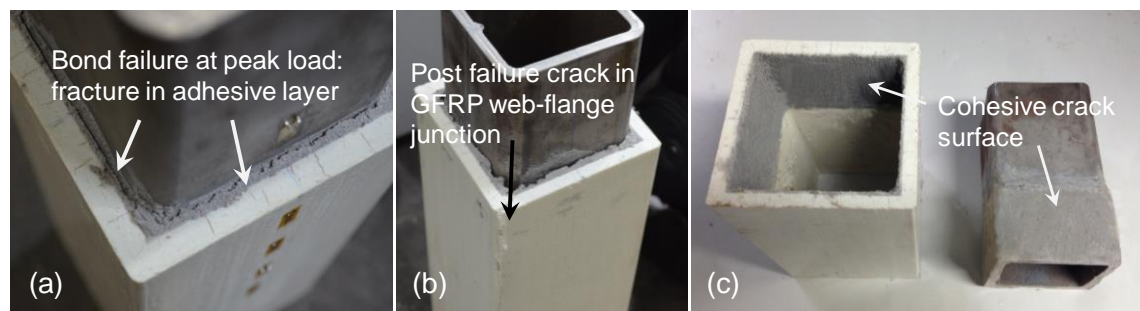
Failure modes of BSJs: (a) adhesive failure at peak load; (b) cracking of GFRP after peak load (BSJ-100-1 and BSJ-140-1); (c) bond failure surface.
